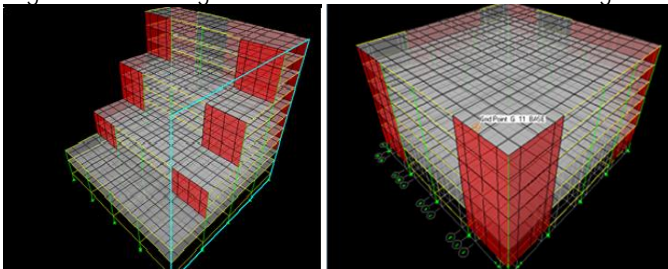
3D view of vertical irregular and Building with shear wall at corner of ground floor and ground floor stiffness altered
